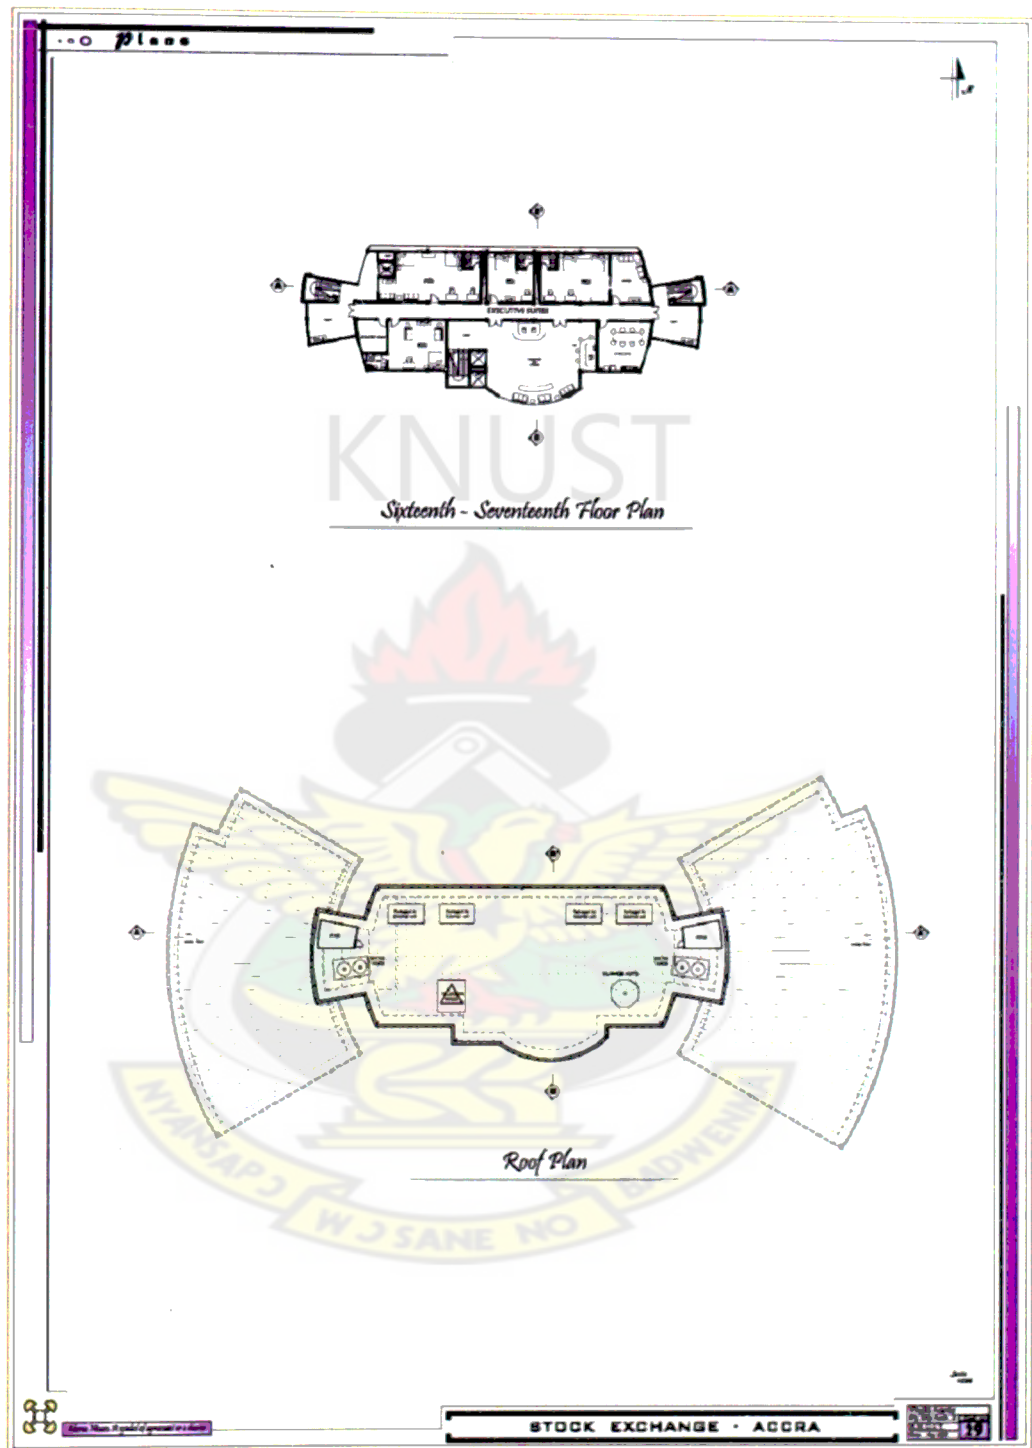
Sixteenth - seventeenth floor plan and Roof plan
